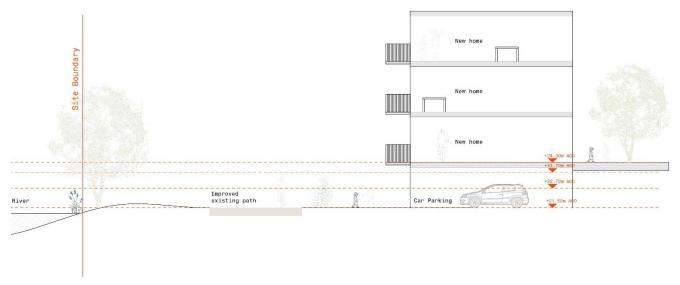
Illustrative section of the river park with a residential building fronting the river. The location of the car park on the ground floor and the new dwelling on the first floor upwards reflects the current masterplan assumptions and highlights the risk of delivering large portions of blank and inactive facades with the new development.
